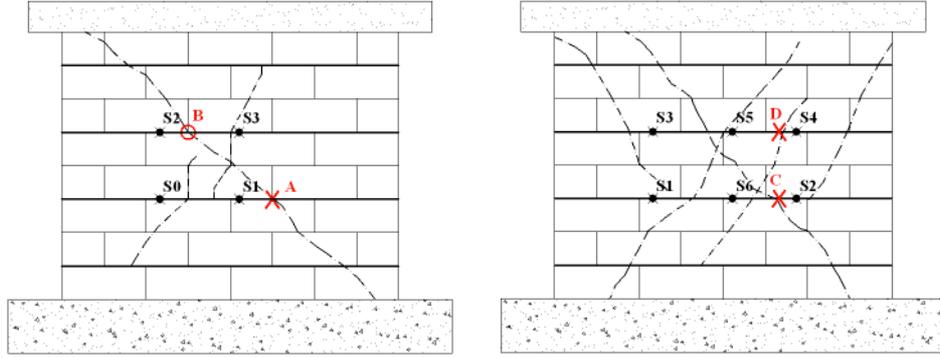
Pattern of the failures (red points) of the horizontal reinforcement in the specimens RDB02 (left) and RDB03 (right)
